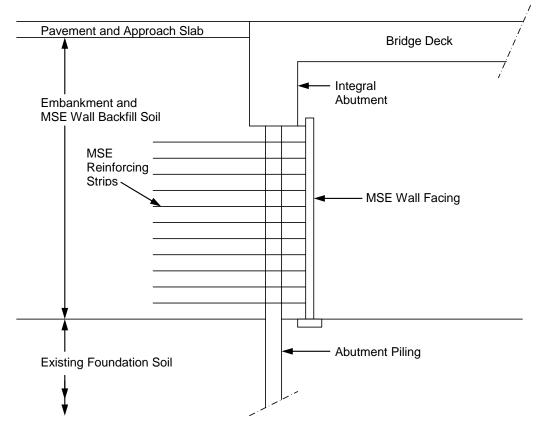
Profile view of MSE system around piling supporting integral bridge abutment.
